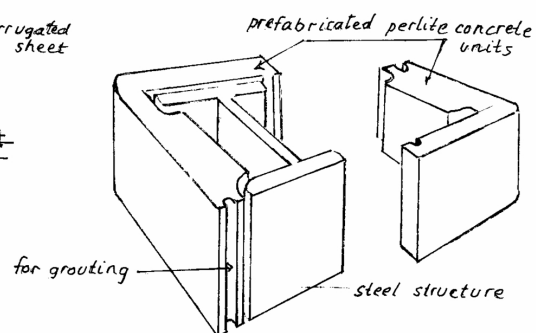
Prefabricated perlite concrete units for fire-proofing
